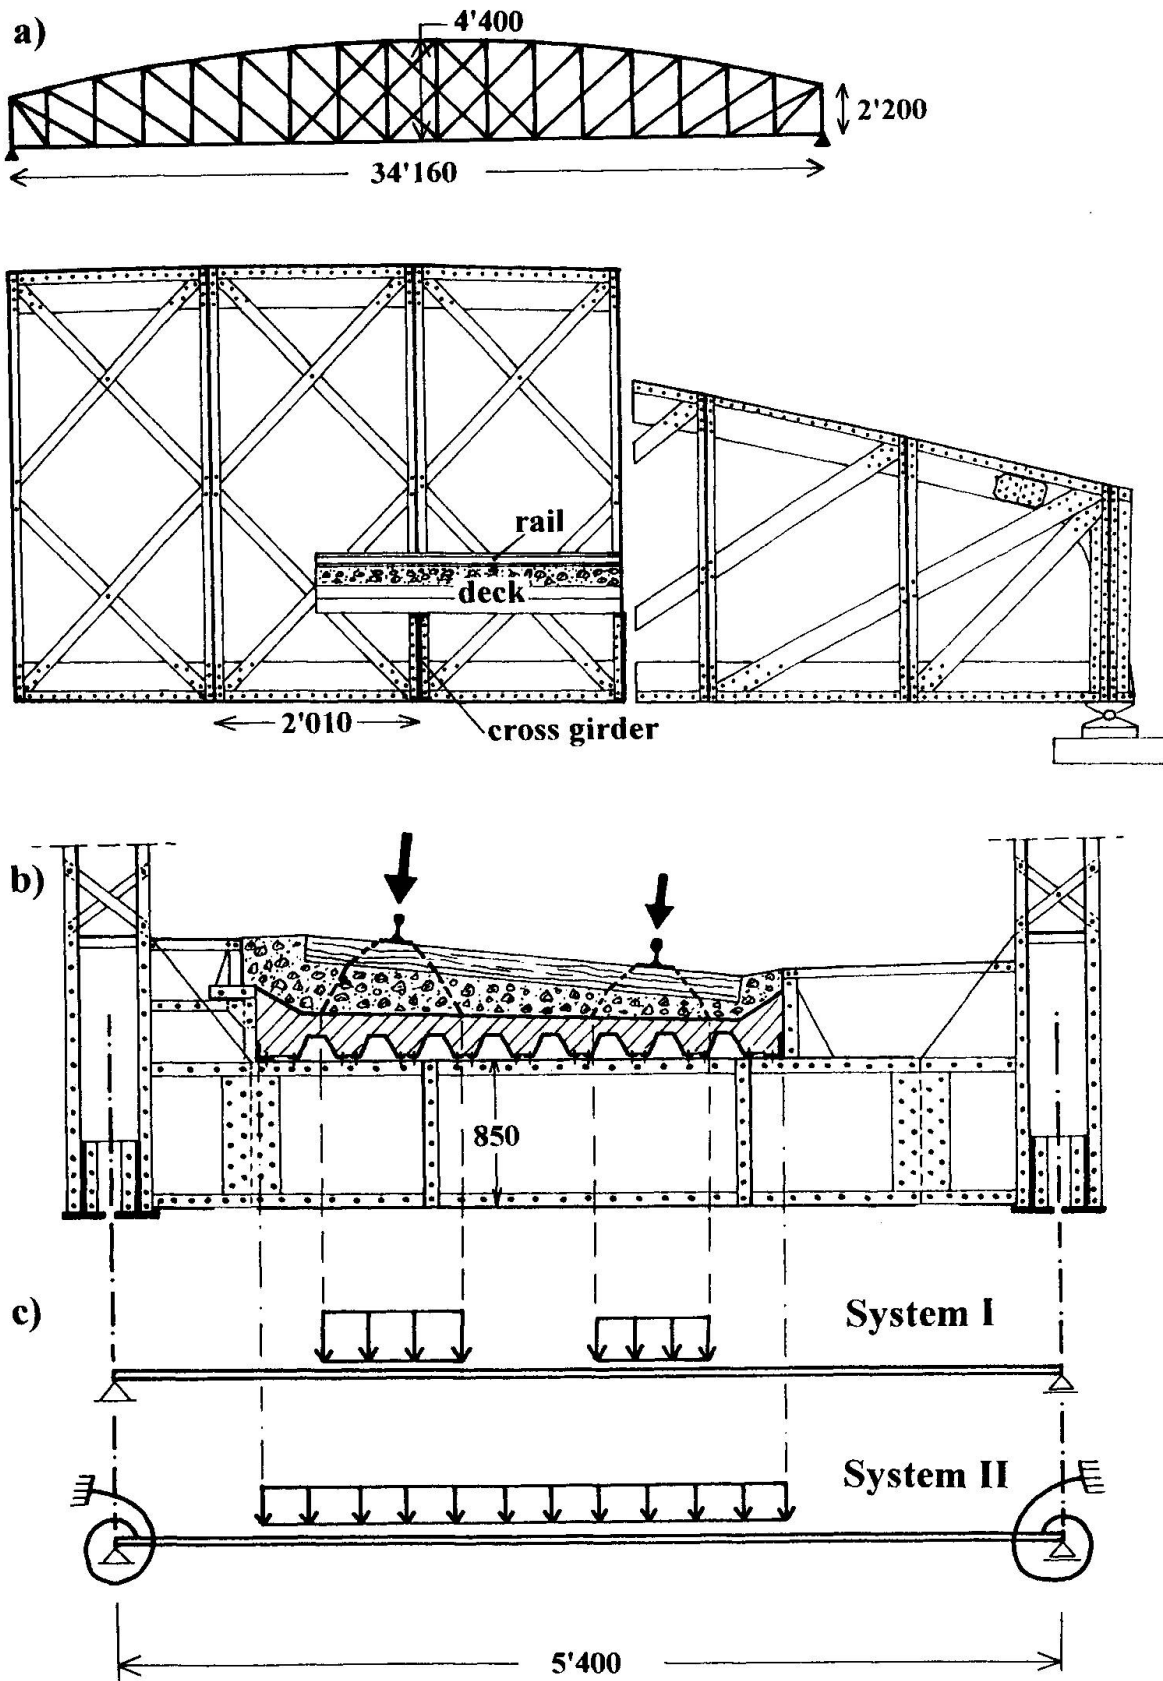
Investigated bridge: a) view of the lattice girder, b) cross section, c) statical systems.
